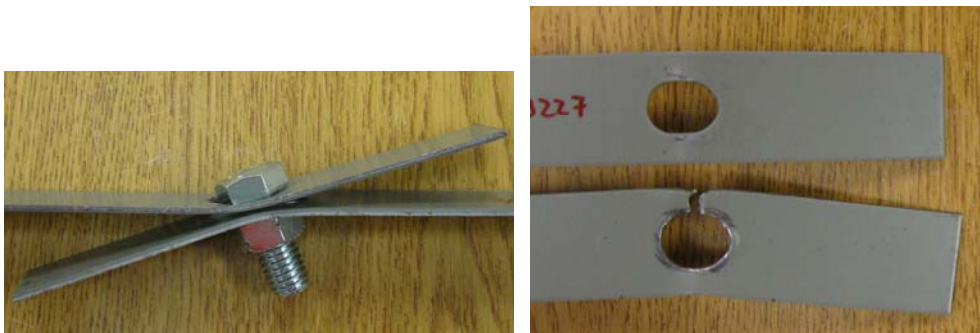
Rupture Failure of Test Specimen 73O-73SSL-1/2-1-S-0.4-T1
